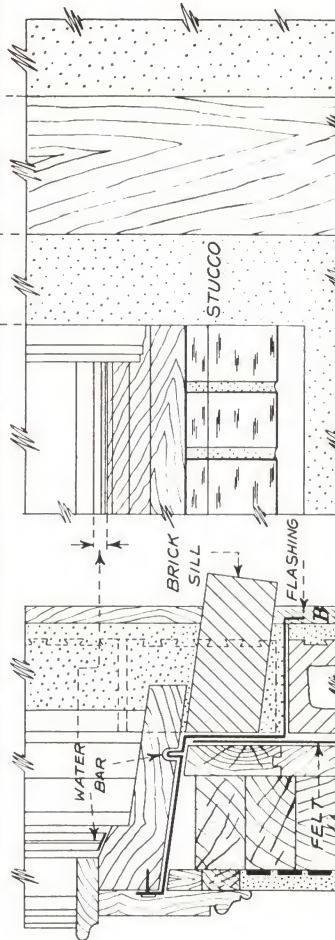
FLASHING WINDOW SILL ON HOLLOW TILE AND STUCCO WALL - SCALE 1 1/2" = 1'-0"
